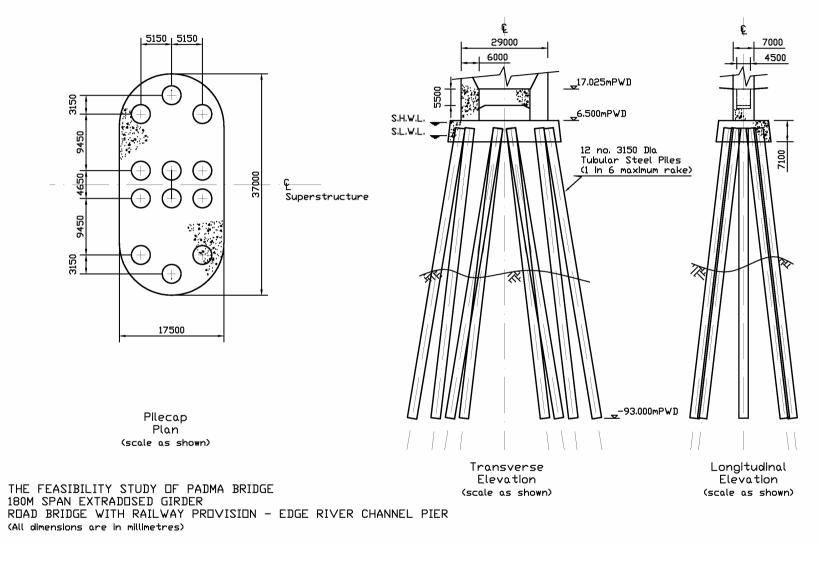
Edge River Substructure General Arrangement (Alternative-HR)
